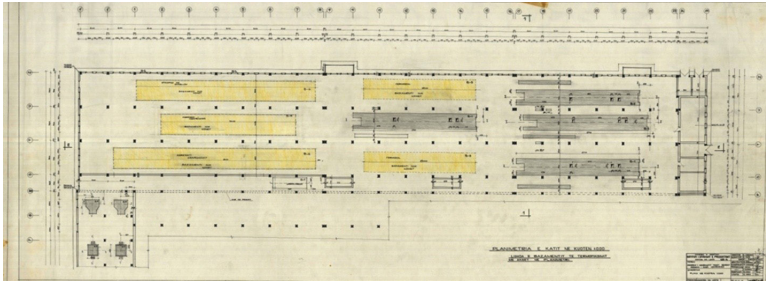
Ground floor plan (Source – Central Technical Archive – Tirana)
